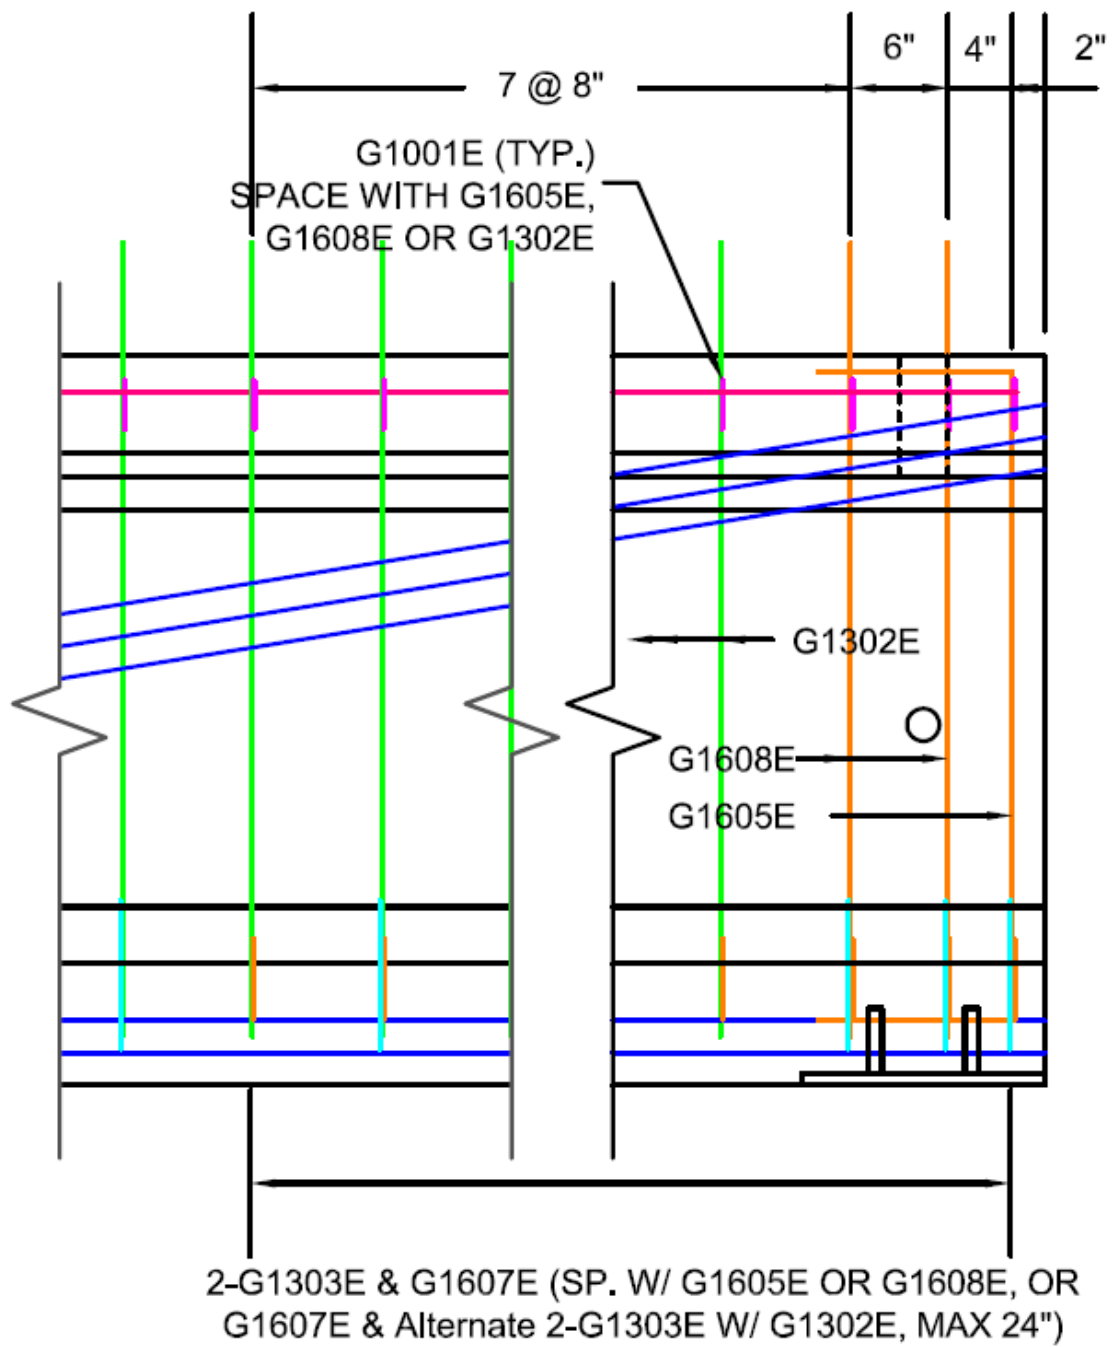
Transverse reinforcement layout for 45M_8W end.
